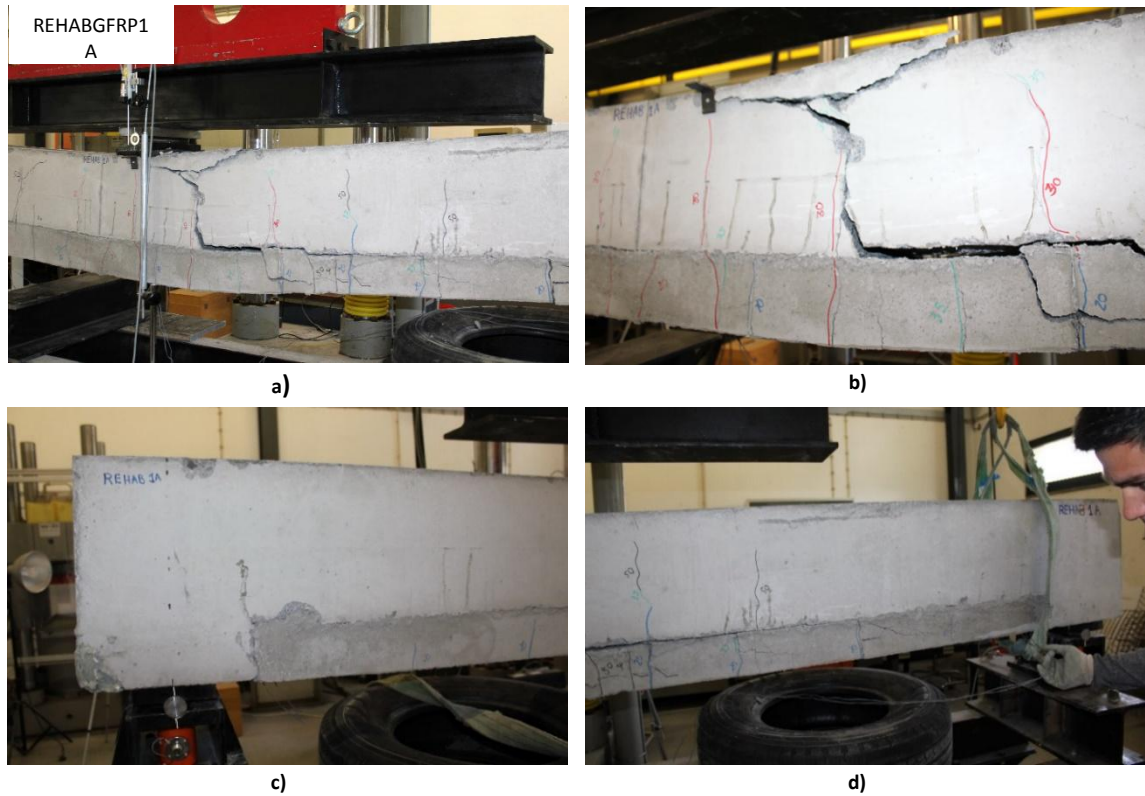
REHABGFRP1A beam failure: a) general view; b) mid-span detail; c) left support; d) right support
